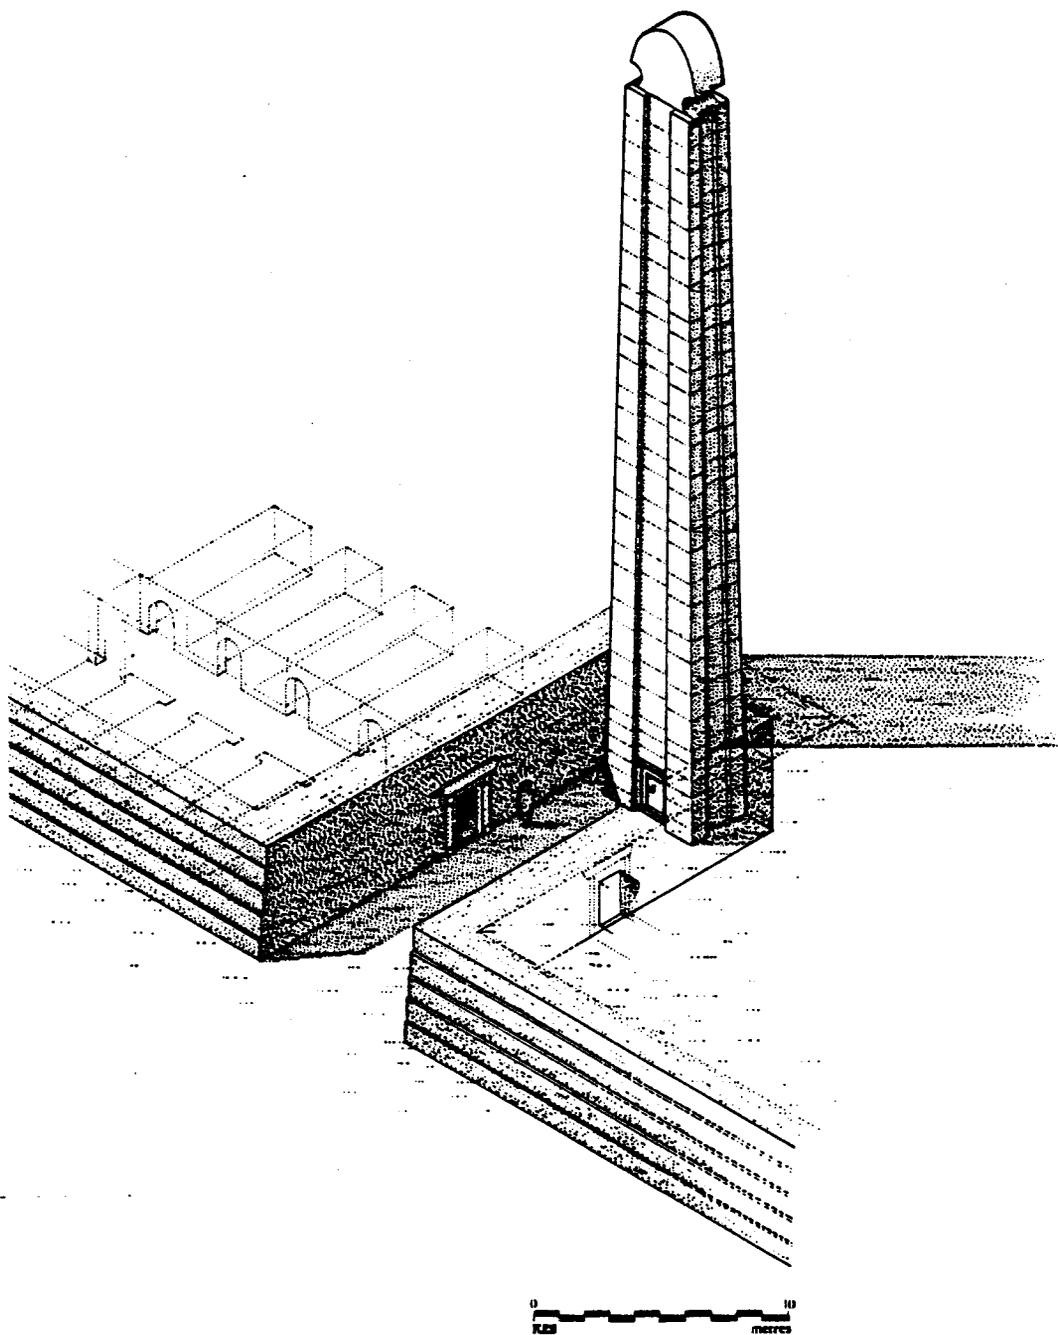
Reconstruction of the possible original design for Stele 1, Mausoleum and East Tomb. The stele may have been intended to stand at a higher level, and the front of the embayment may have been walled in.
